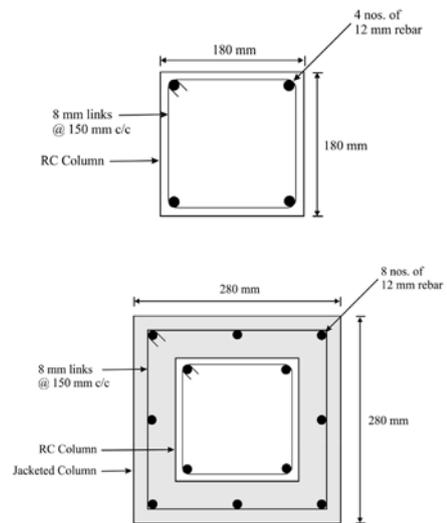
Reinforcement detailing of non-jacketed and jacketed columns.
